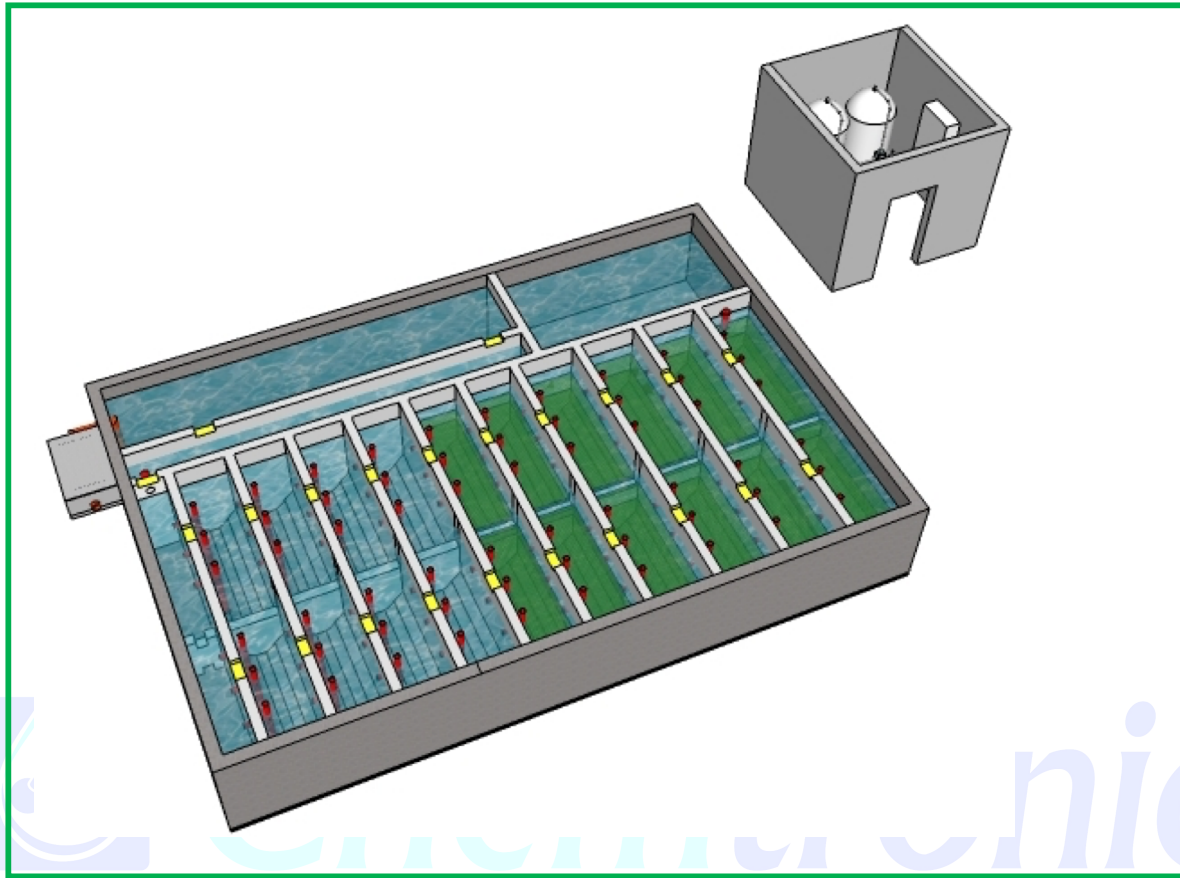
, AD Tank, Oxidation Tank, Final Treated Water Tank & Plant Room.
